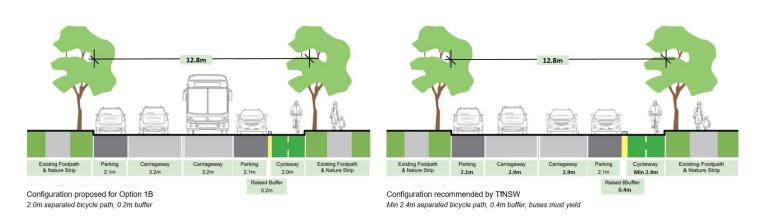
Constrained configuration for a 12.8m carriageway, retaining parking on both sides of the road. Source: TfNSW Cycleway Design Toolbox, p.32)
